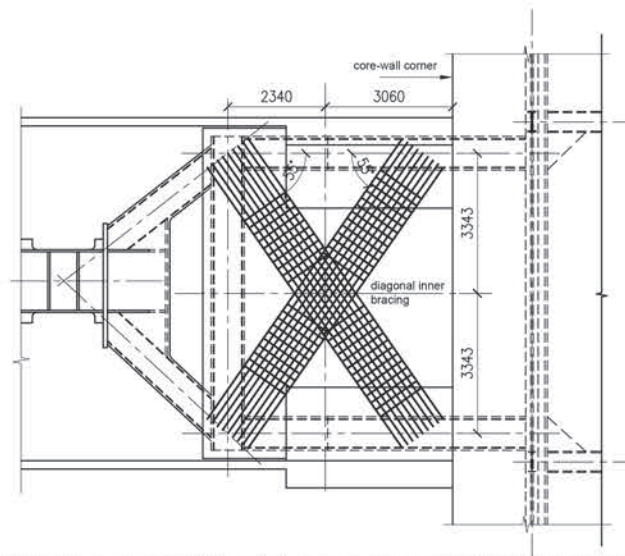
The sketch of reinforcement arrangement of outrigger wall
